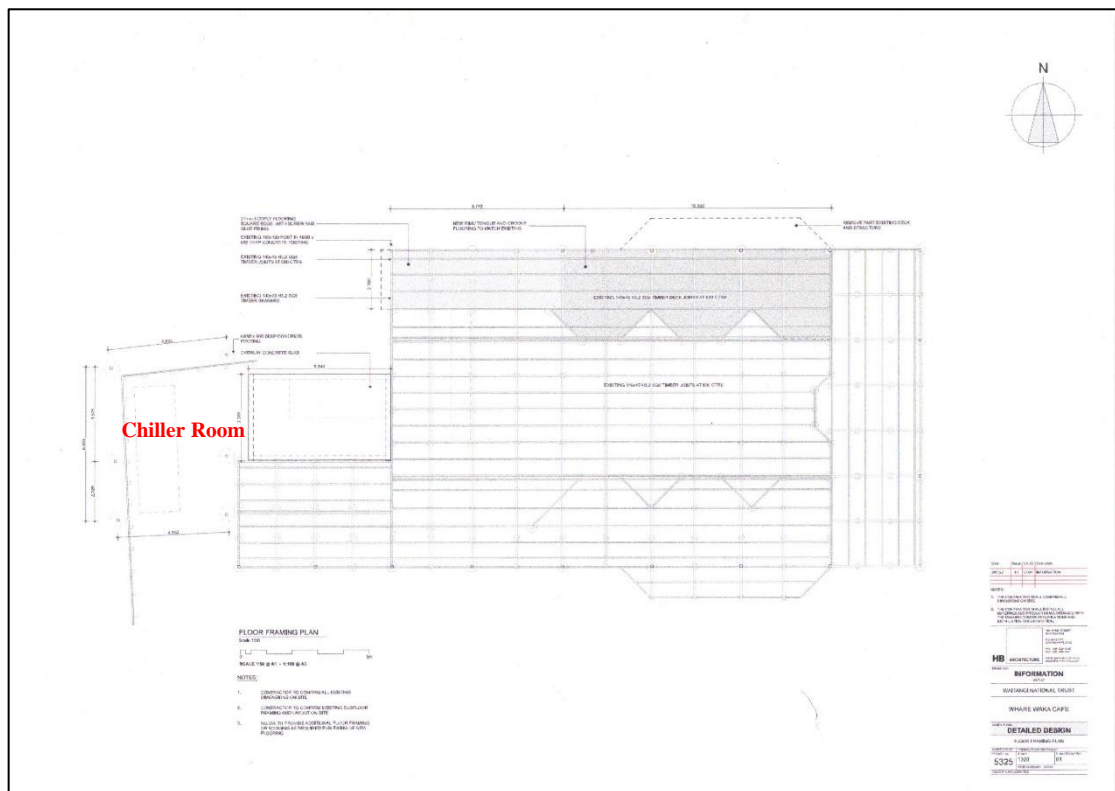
Whare Waka Café layout plan (HB Architecture July 2023).
